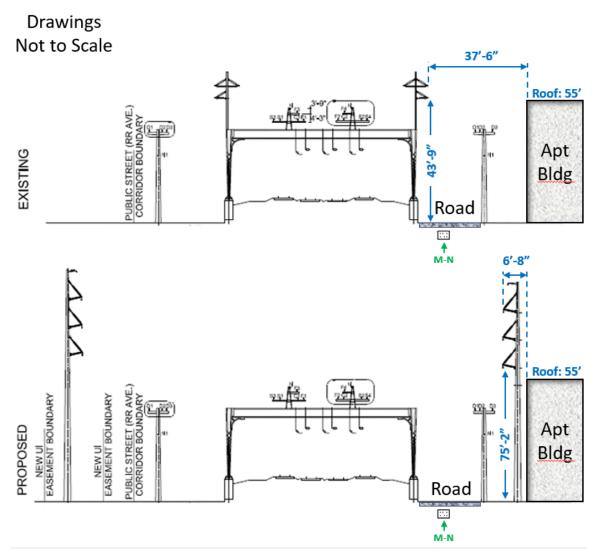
Existing and proposed configurations of the Project-related transmission lines and CT DOT catenary structure in a subsection of XS–17 at the apartment building along Railroad Avenue in Bridgeport (view facing northeast).
